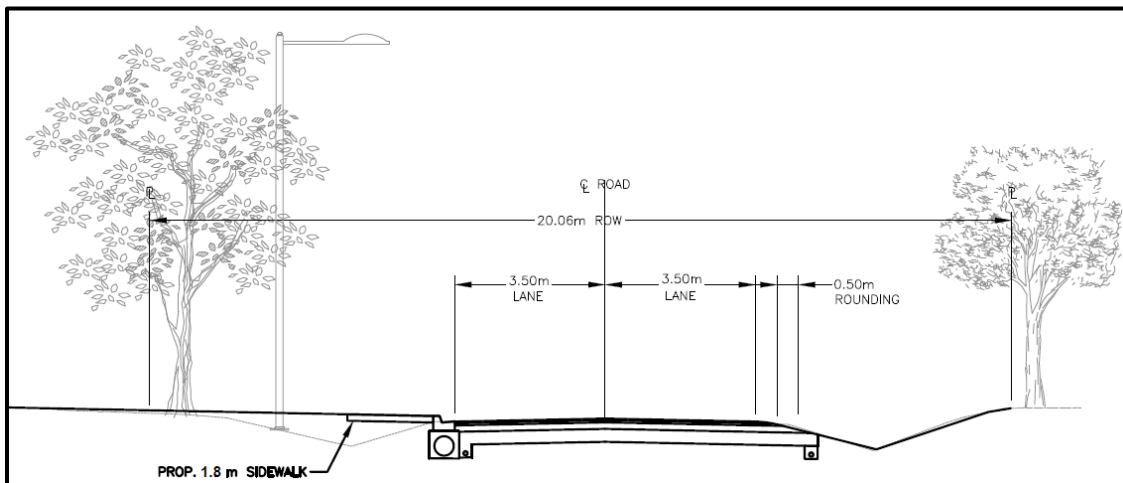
Proposed sidewalk north side Ruthel Road to existing sidewalk
